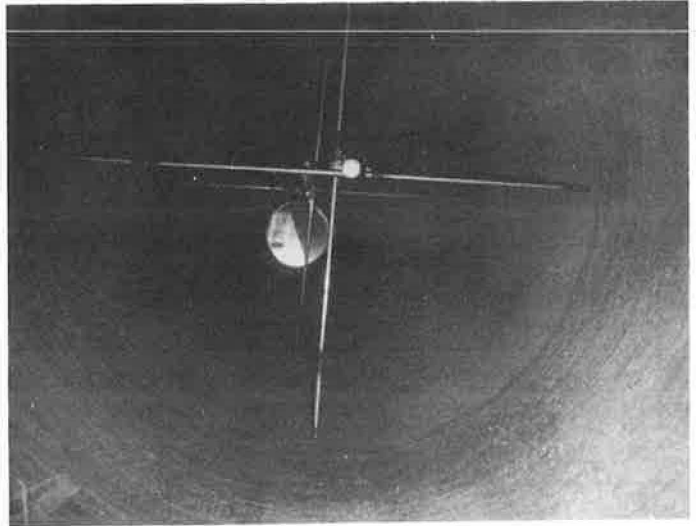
Sand being dropped into 126-in. (3200-mm) cylinder centered over alternate test sections to simulate field load.
